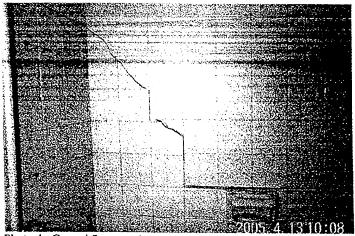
Ground floor, northeast apartment. Close-up of damaged ceramic tile wall.
